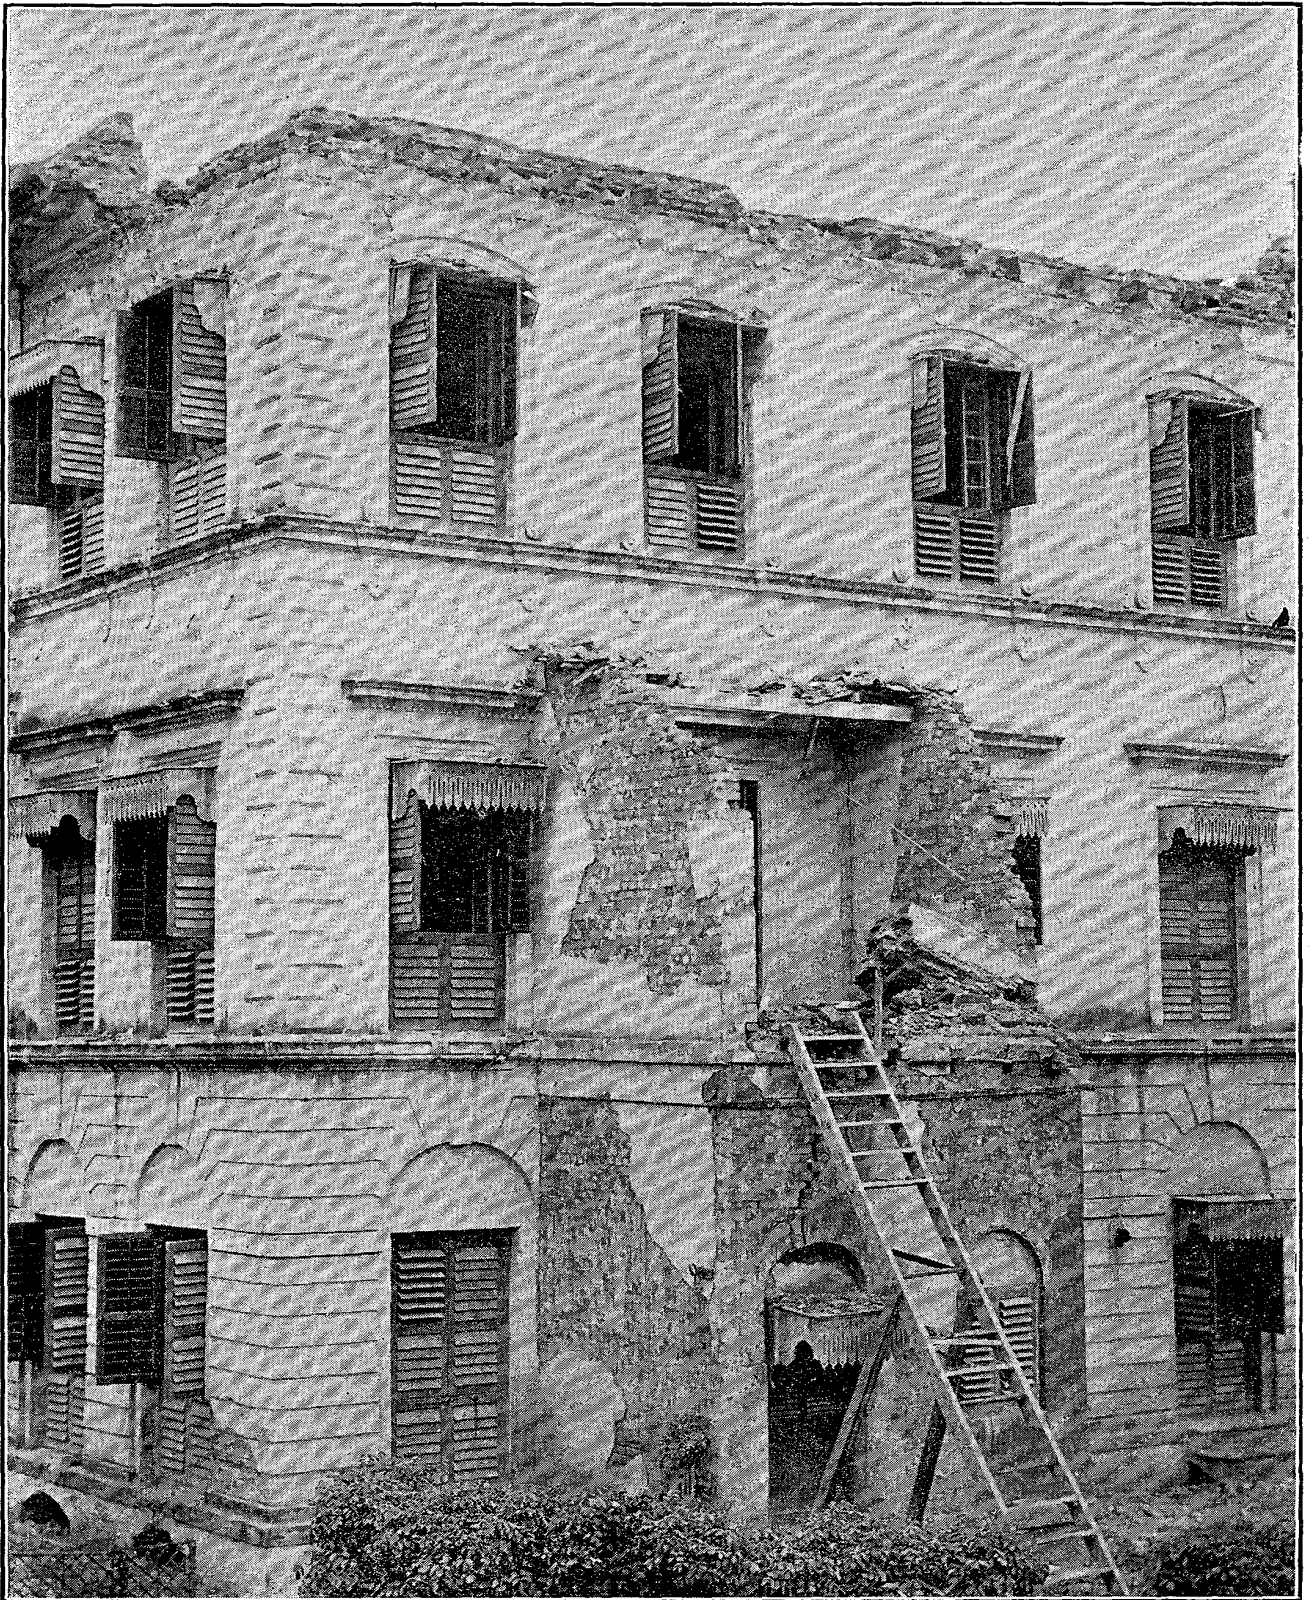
No. 9 Russell Street, Calcutta, Back View.
